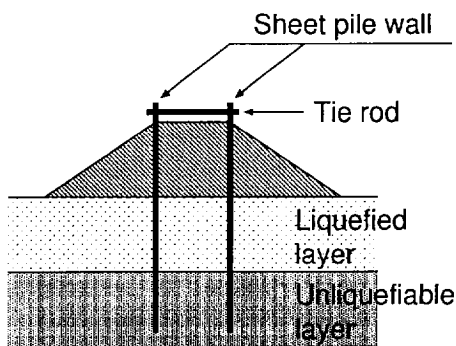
Schematic vies of installation of sheet pile walls at top of dike.
